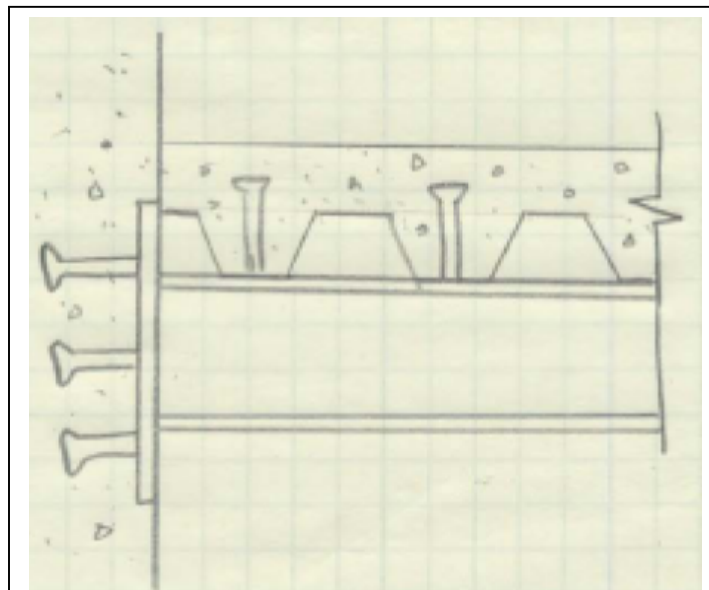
SECTION DETAIL OF COMPOSITE METAL DECK ON BEAM AT CONCRETE CORE CONNECTION
